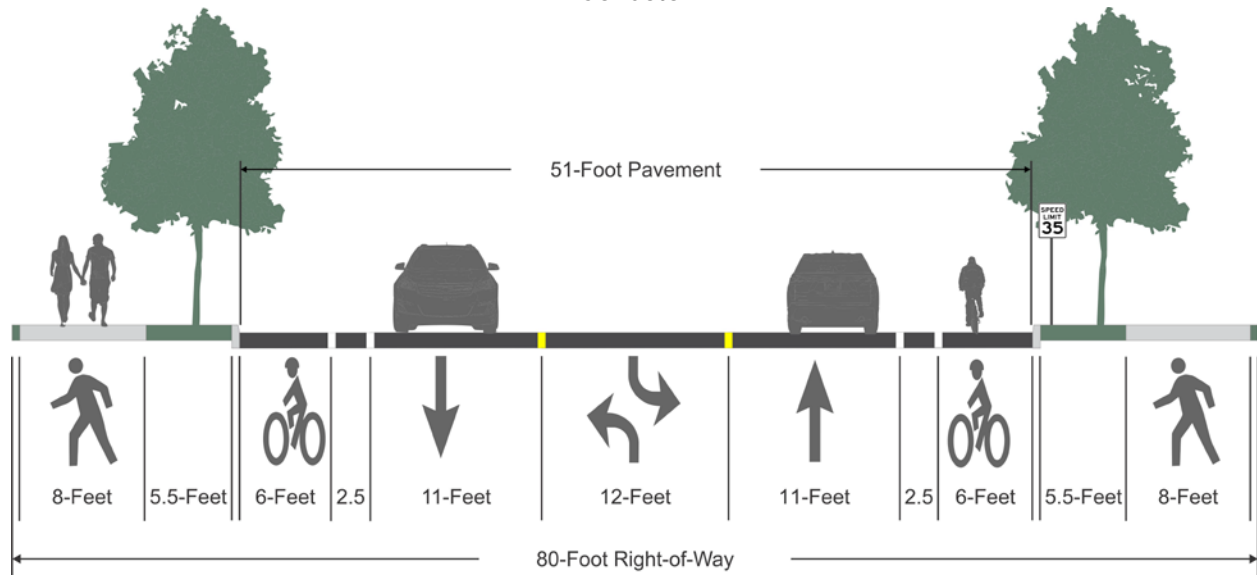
Gateway North Street Type Plan and Standards
